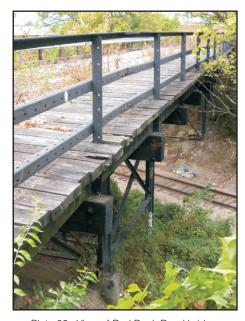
View of Red Bank Road bridge, currently closed, facing northwest.
